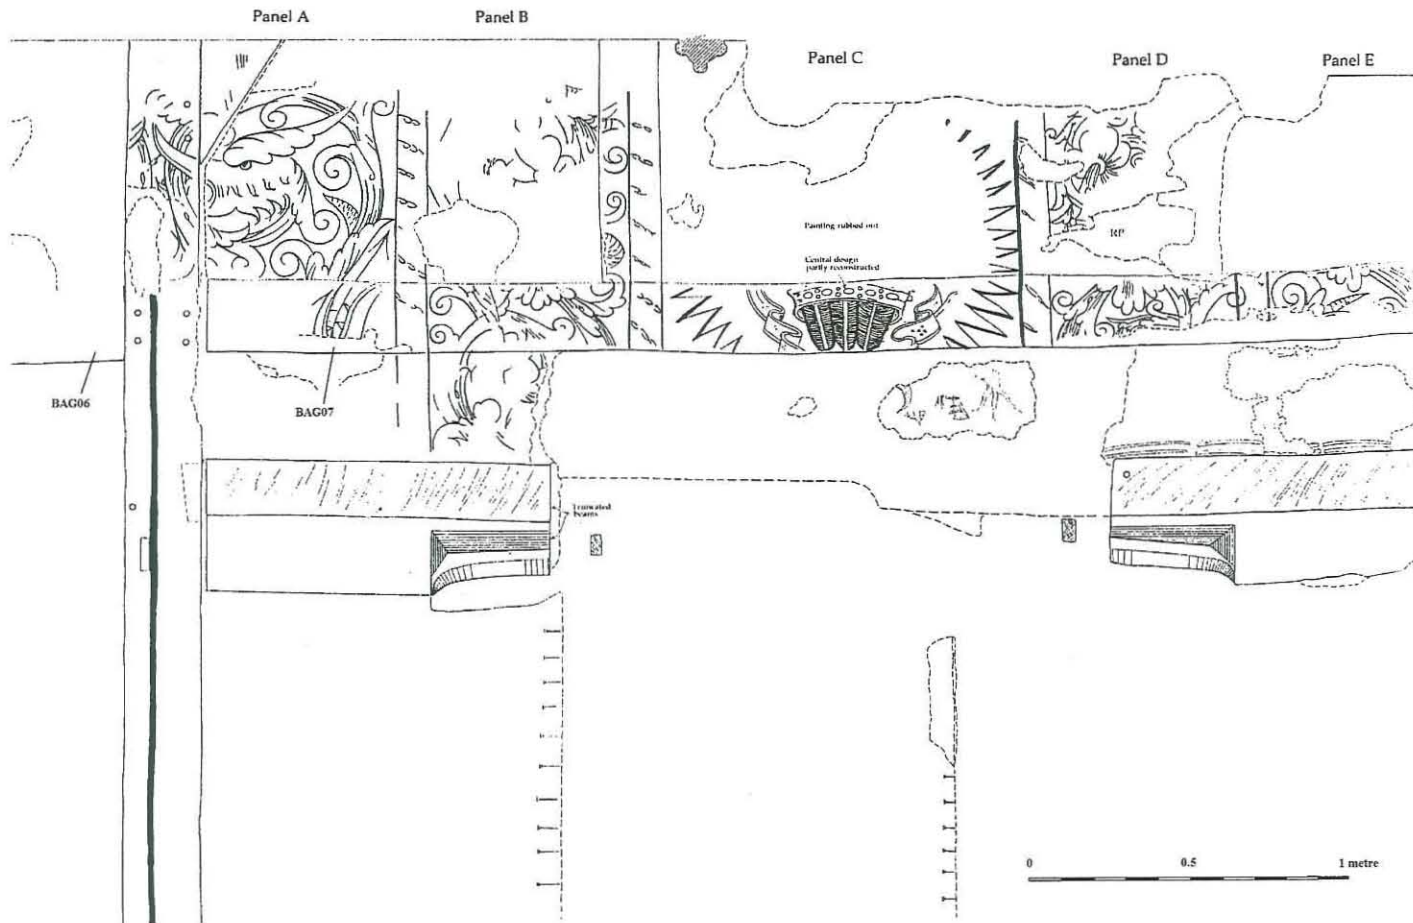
West wall elevation showing the locations of samples taken for dendrochronology (adapted from an original by David Williams)
